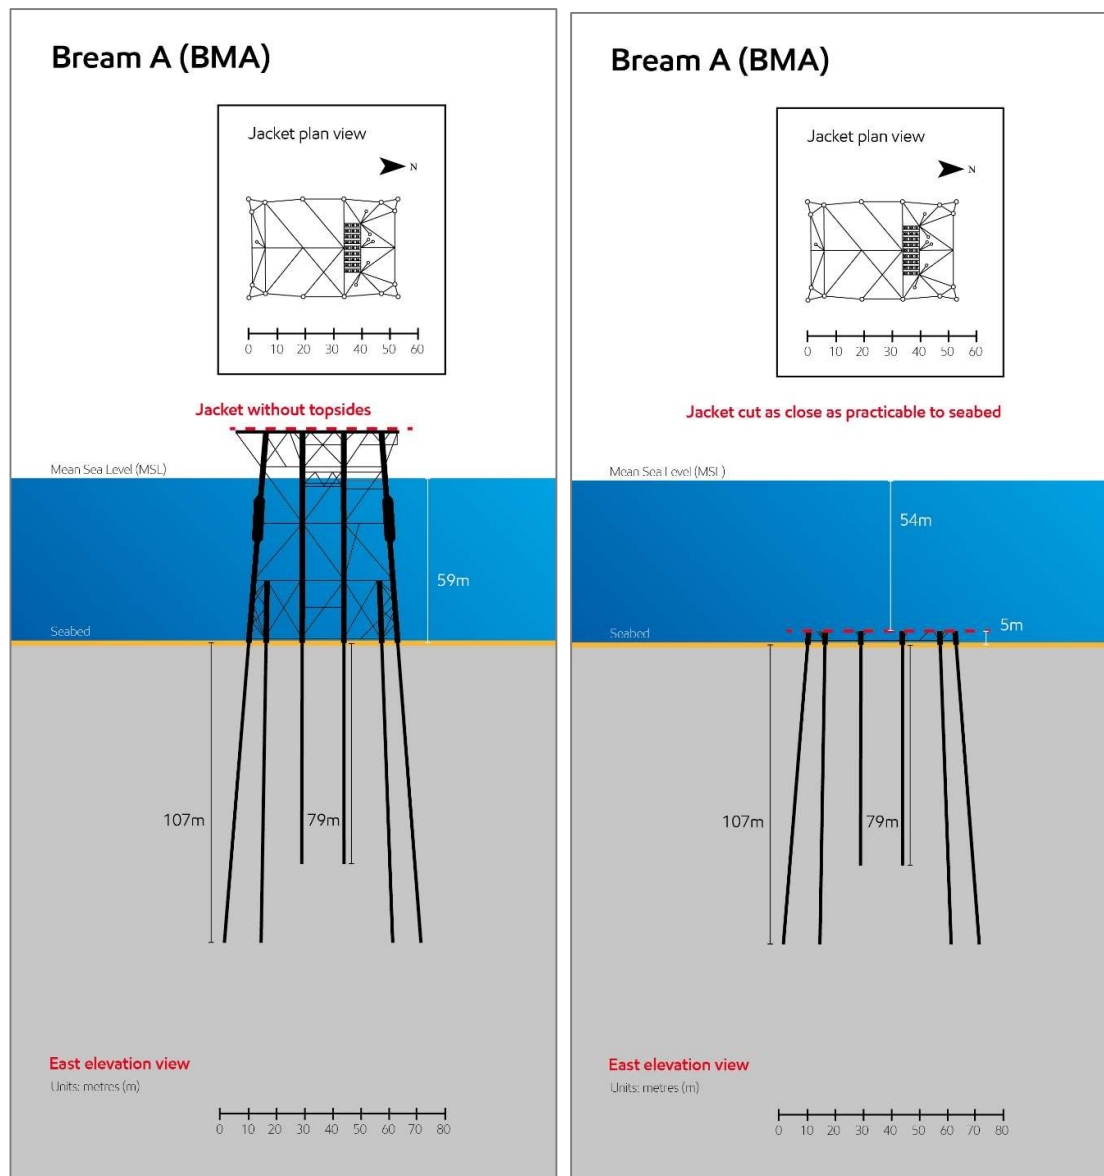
Bream A Steel Piled Jacket without topsides (left) and under proposed end state (right)
